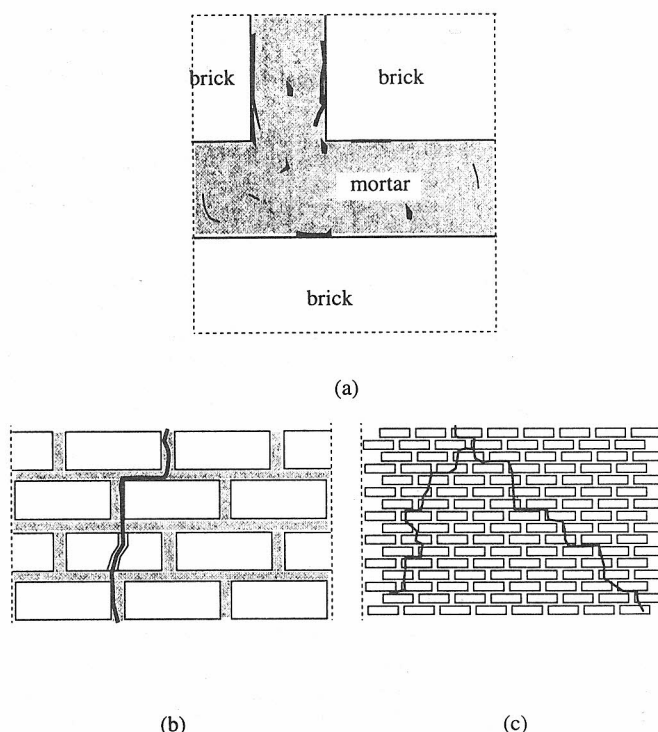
Multiscale Fracture Process in Brick Masonry: (a) Microscopic Fracture; (b) Mesoscopic Fracture; (c) Macroscopic Fracture
